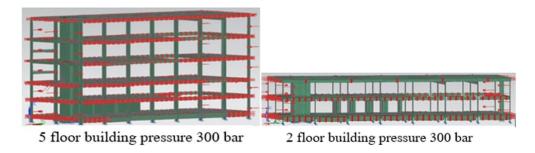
Pressure load of 300 bars affecting the buildings externally.
